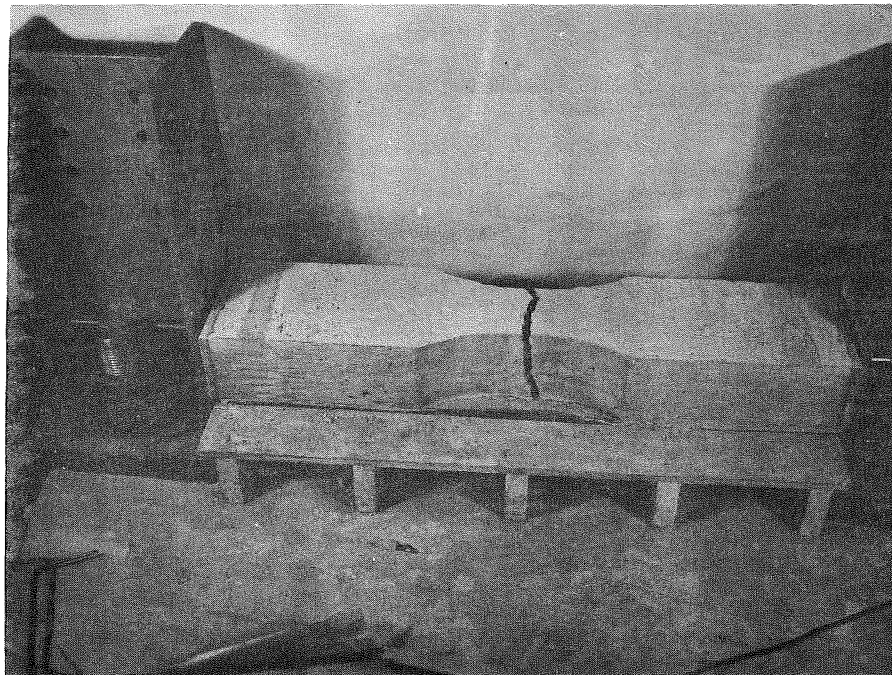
TYPICAL FAILURE OF TENSION SPECIMENS
